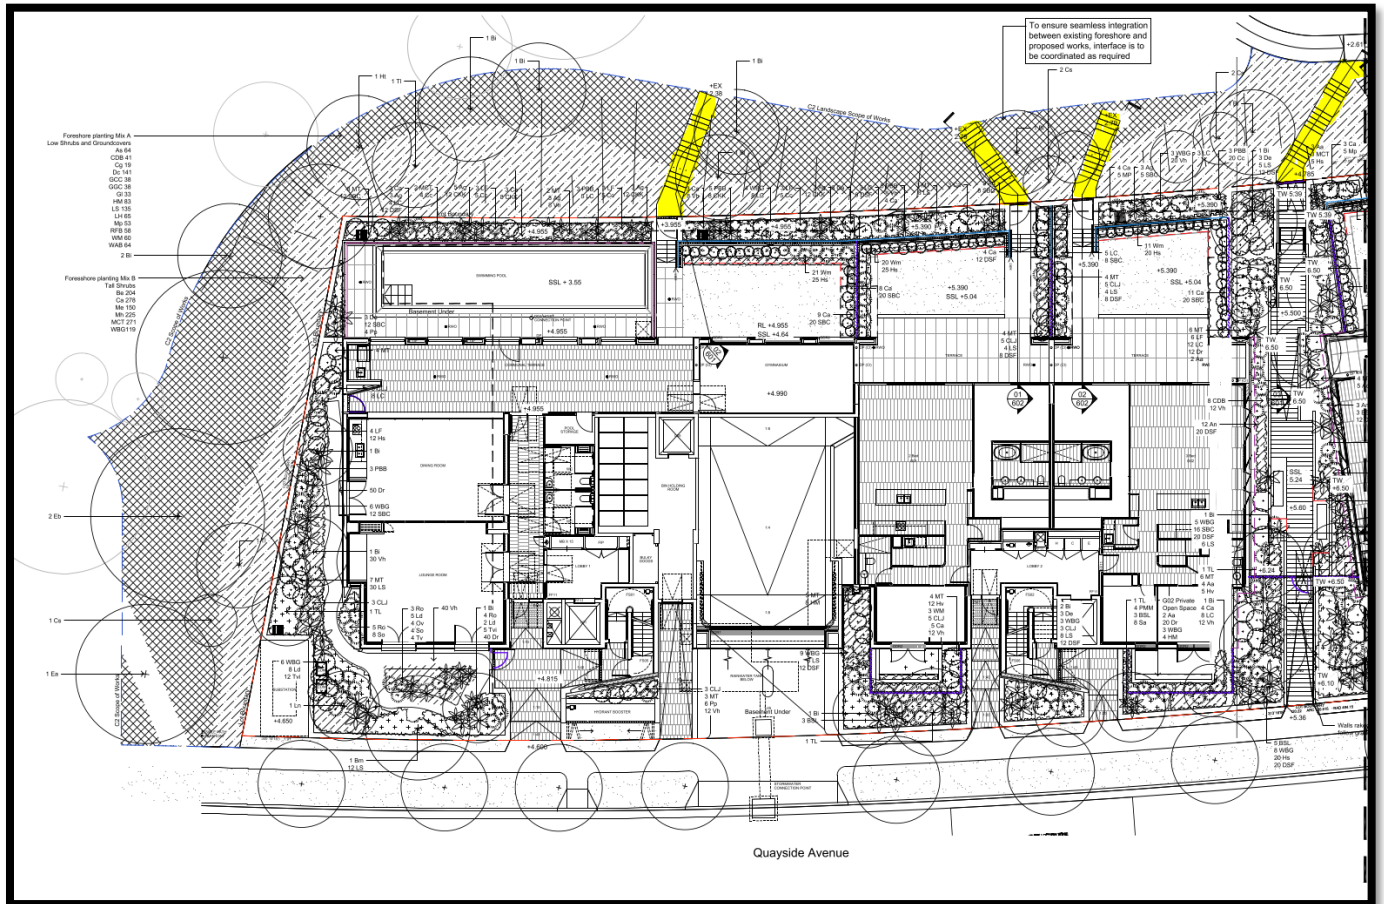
Stepped access to COS, Pedestrian walkthrough and apartments 1 and 2
